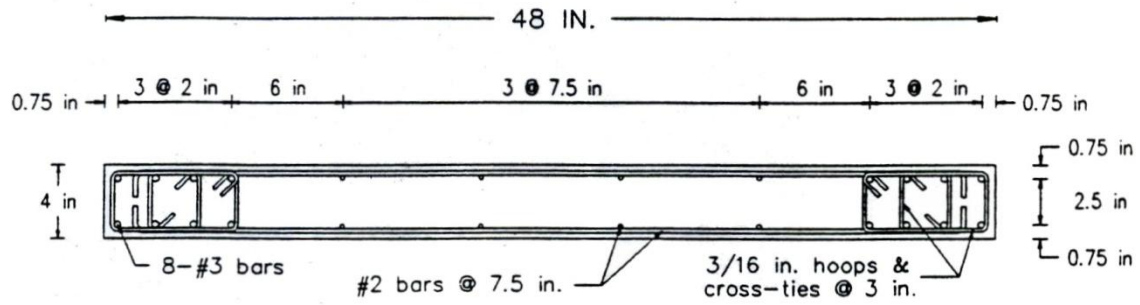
Section of Rectangular Wall RW1 Tested by Thomsen and Wallace [1995]
